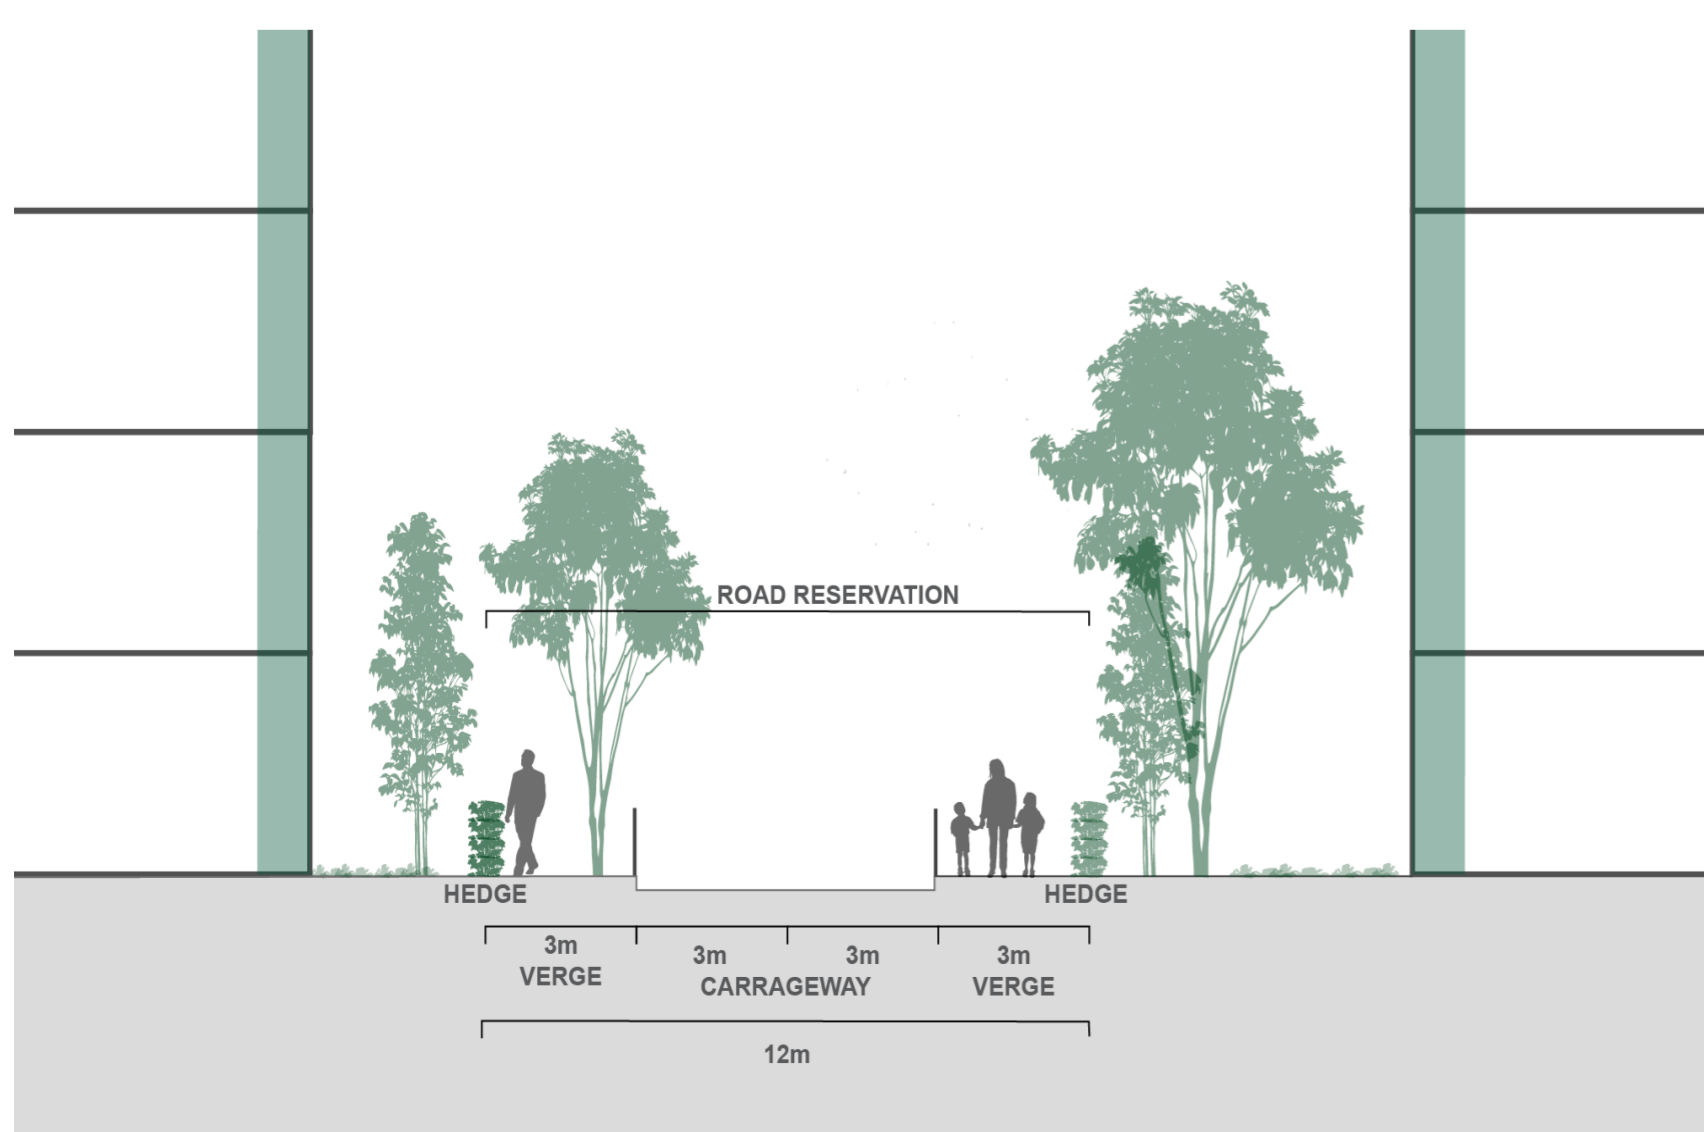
(a) Section of New Connecting Road between Berry & Park Road (item c.)
